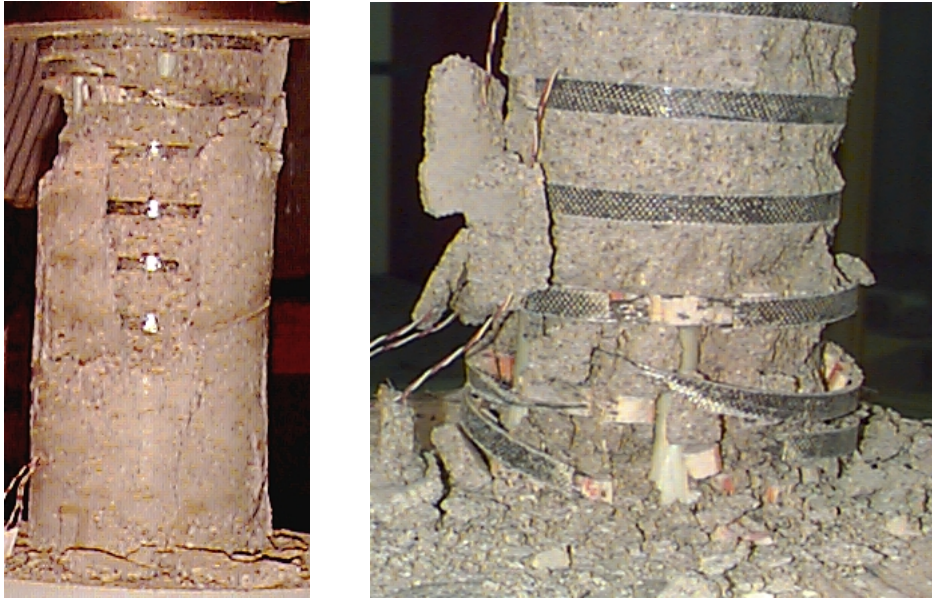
PHOTOGRAPHS OF COLUMN A IN AXIAL COMPRESSION, SHOWING SPALLING & END FAILURE
